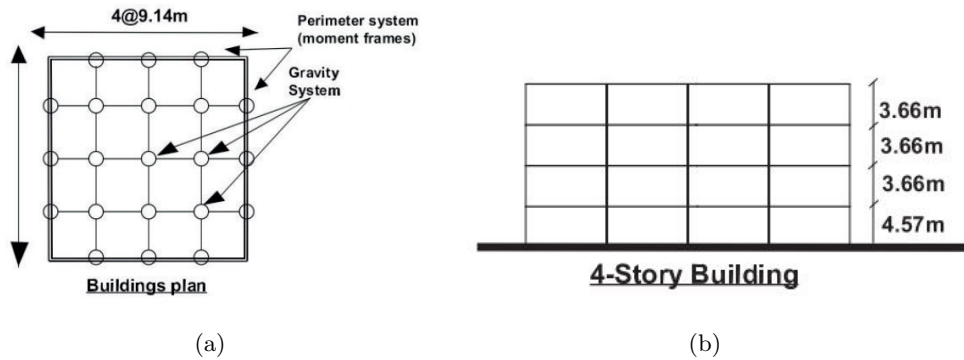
Frame model adopted from Maleki et al. (2018) showing (a) plan of the moment resistant perimeter frame and (b) the elevation of the frame (Maleki et al., 2018).
